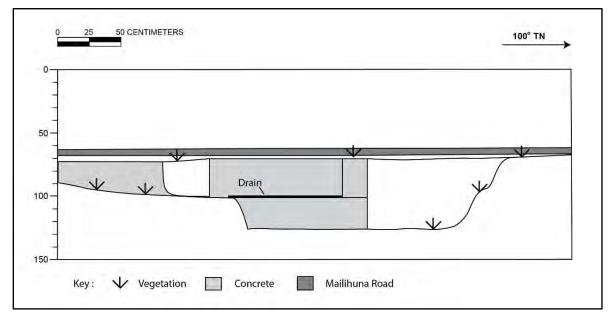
Profile of SIHP # -2279, Feature B, showing culvert box and drain
